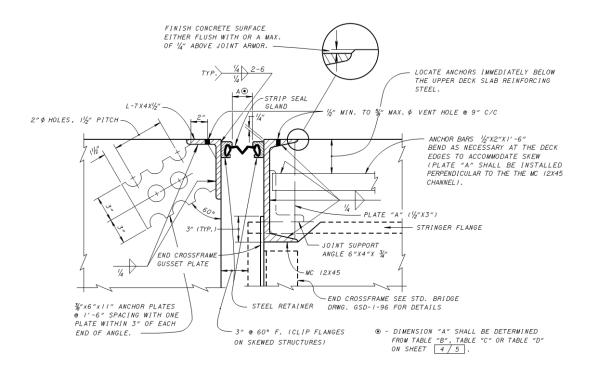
ODOT strip seal joint detail (steel stringer bridge)
